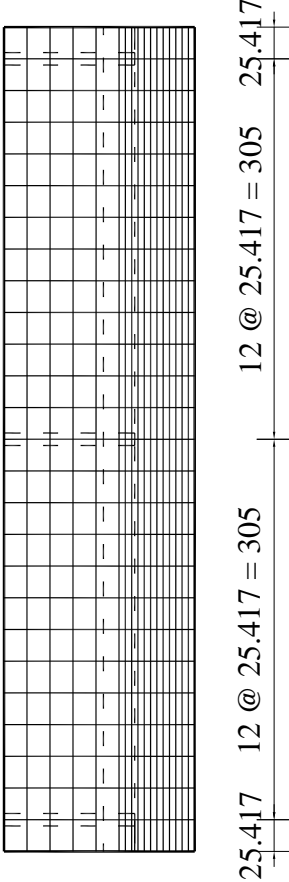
Finite element discretization along the height of NRC Columns 10, 11, and 12 (dimensions in mm)
